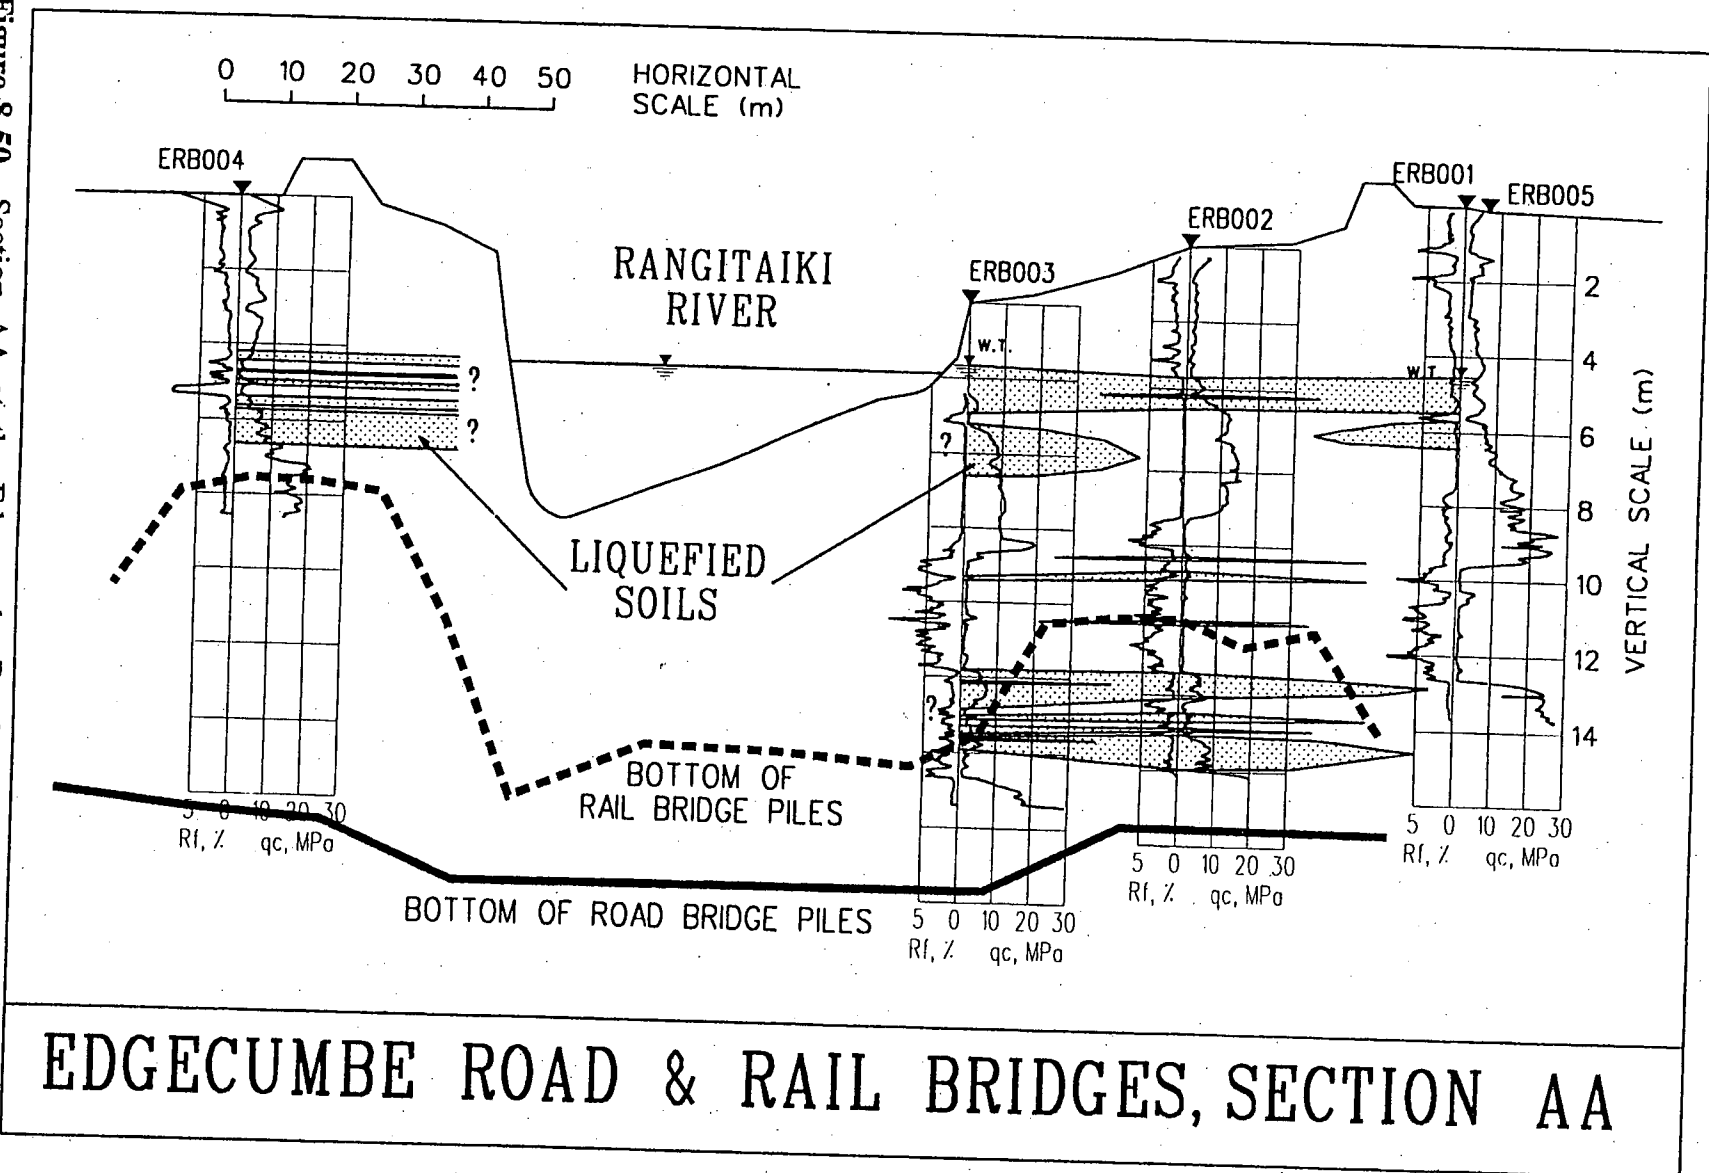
Section AA at the Edgecumbe Road and Rail Bridges site indicating the estimated liquefied strata and the depth to which the bridge piles have been driven.
